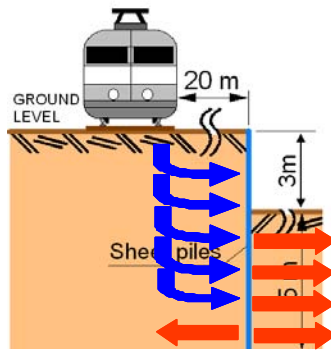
Case A Stray currents path through the sheet pile wall (blue arrows indicate currents entering the structure)
